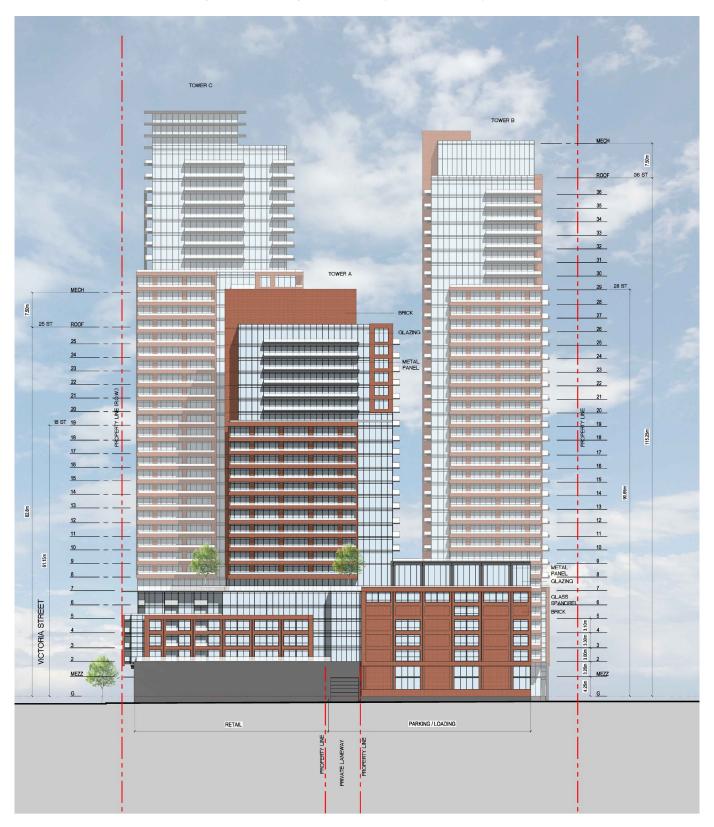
IMAGE: Proposed eastern building elevations facing Bramm Street (Source: IBI Group).
